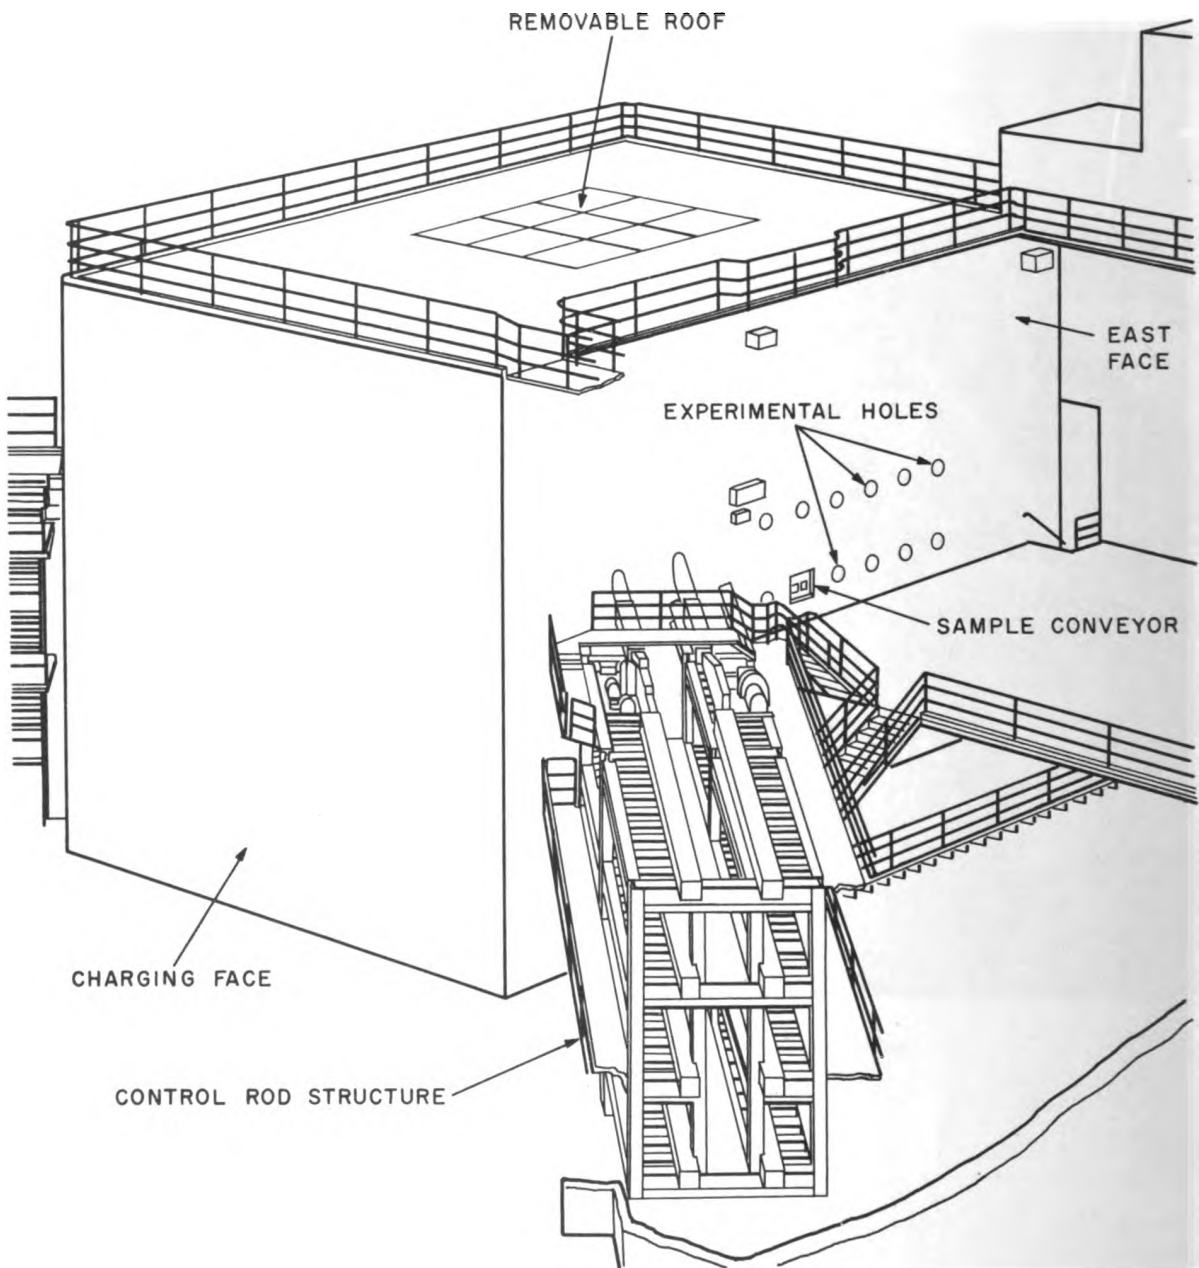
Isometric view of reactor, showing location of control rods and experimental holes.
